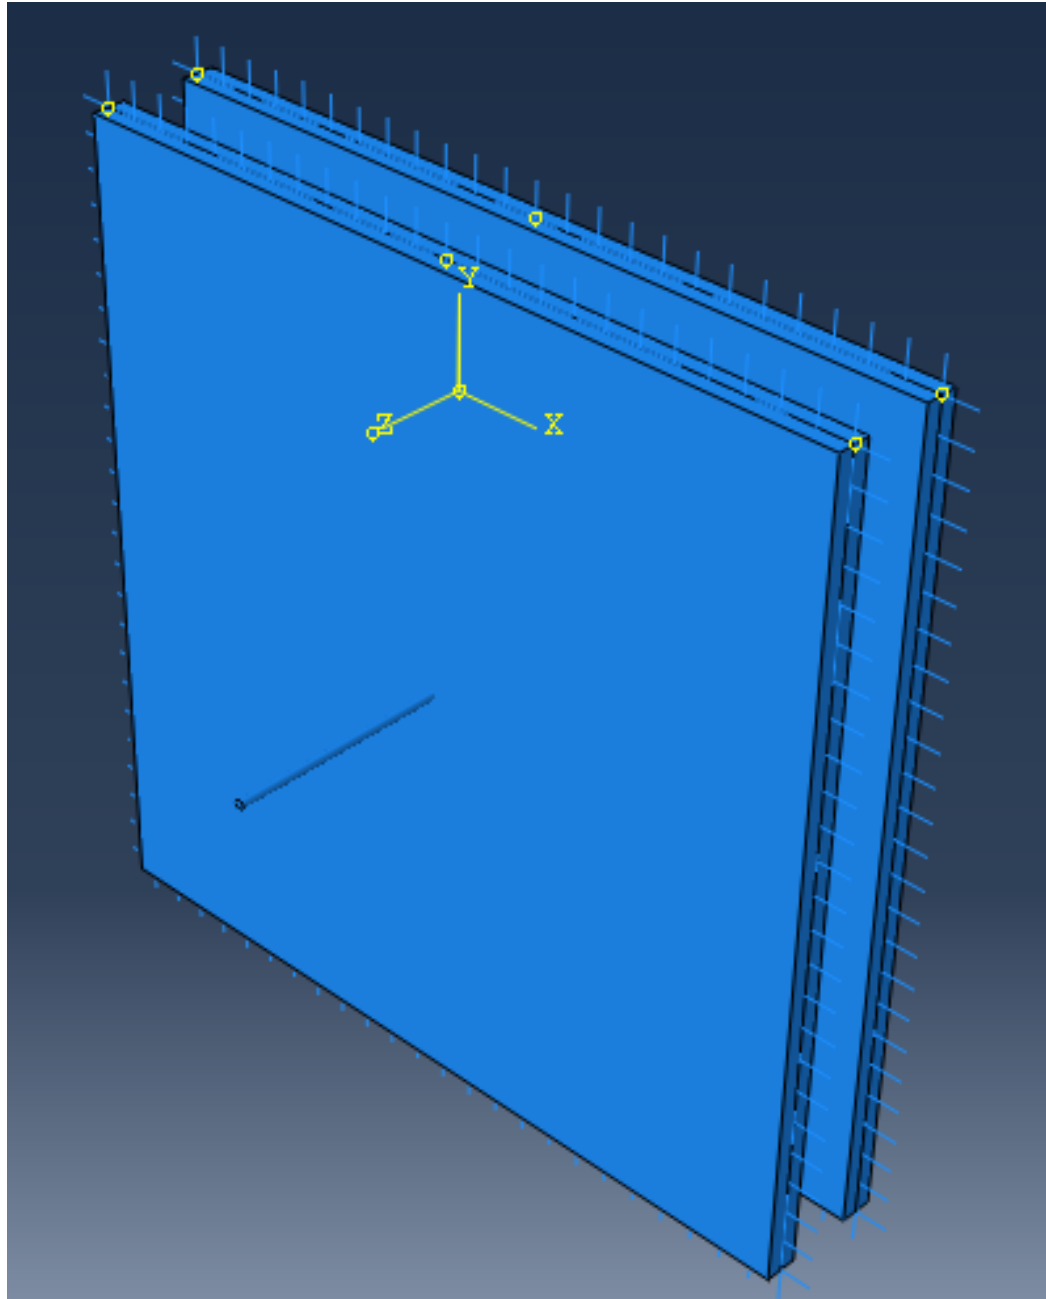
Two Concrete Layers and Steel Mesh with One Anchor
